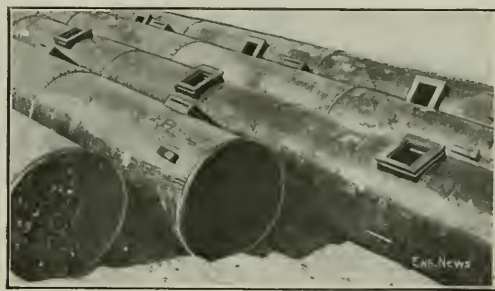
20-IN. SHORE PIPES FOR HYDRAULIC DREDGE, WITH BOTTOM DISCHARGE OPENINGS FOR BUILDING LEVEES
